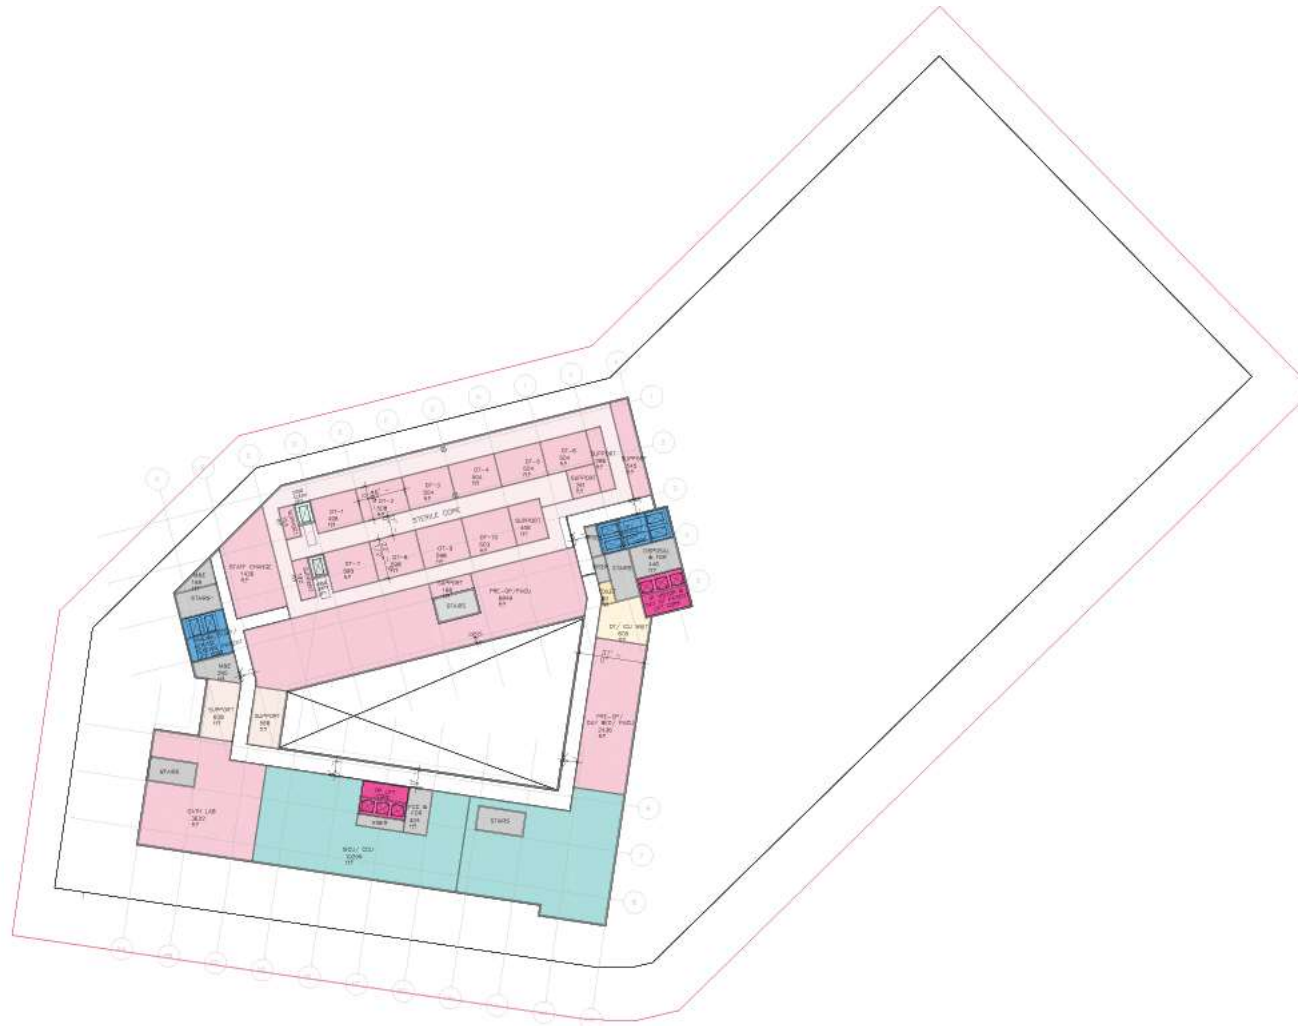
Fourth Floor Plan of Novacare Hospital Project
